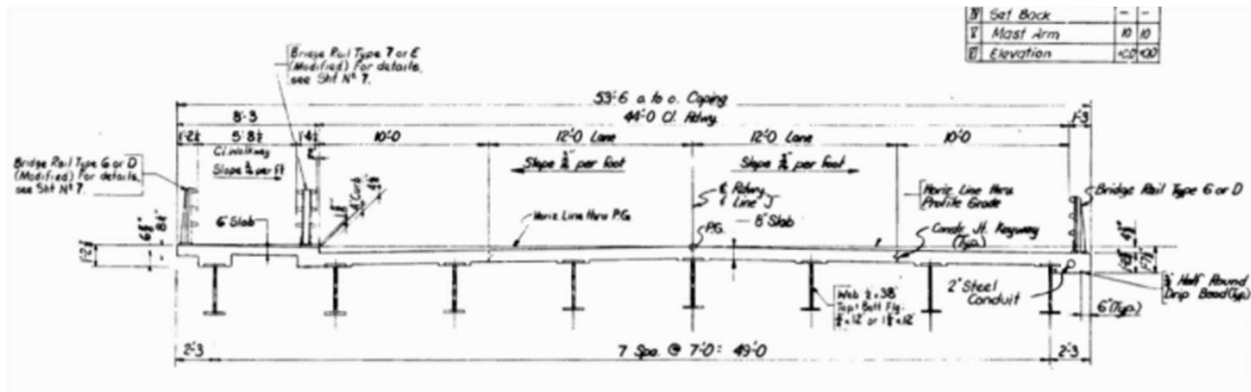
Typical Section of Bridge (NBI 19430) (1982)
